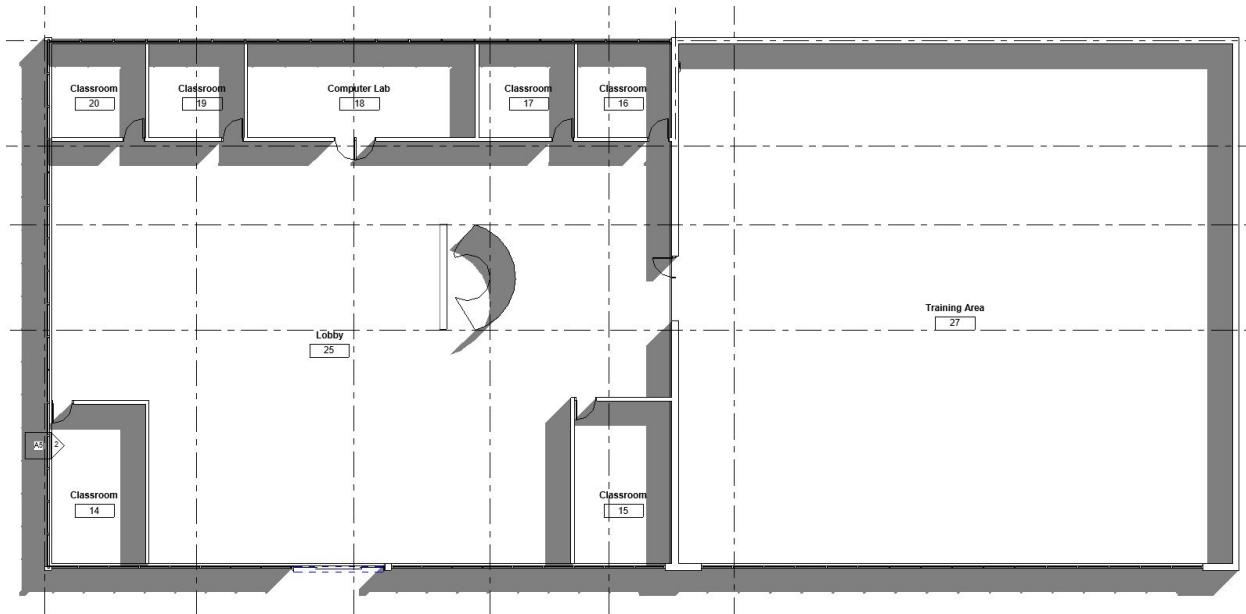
Floor Plan of the Training Facility First Floor
